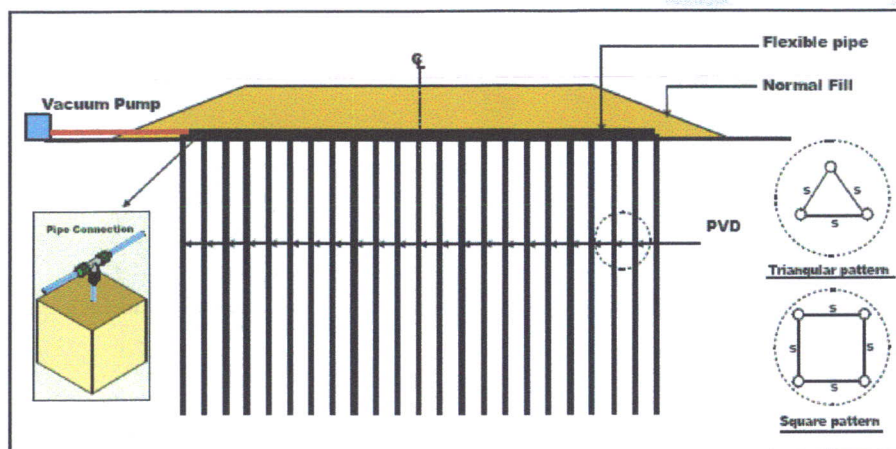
Consolidation using prefabricated vertical drains with vacuum preload arrangement
